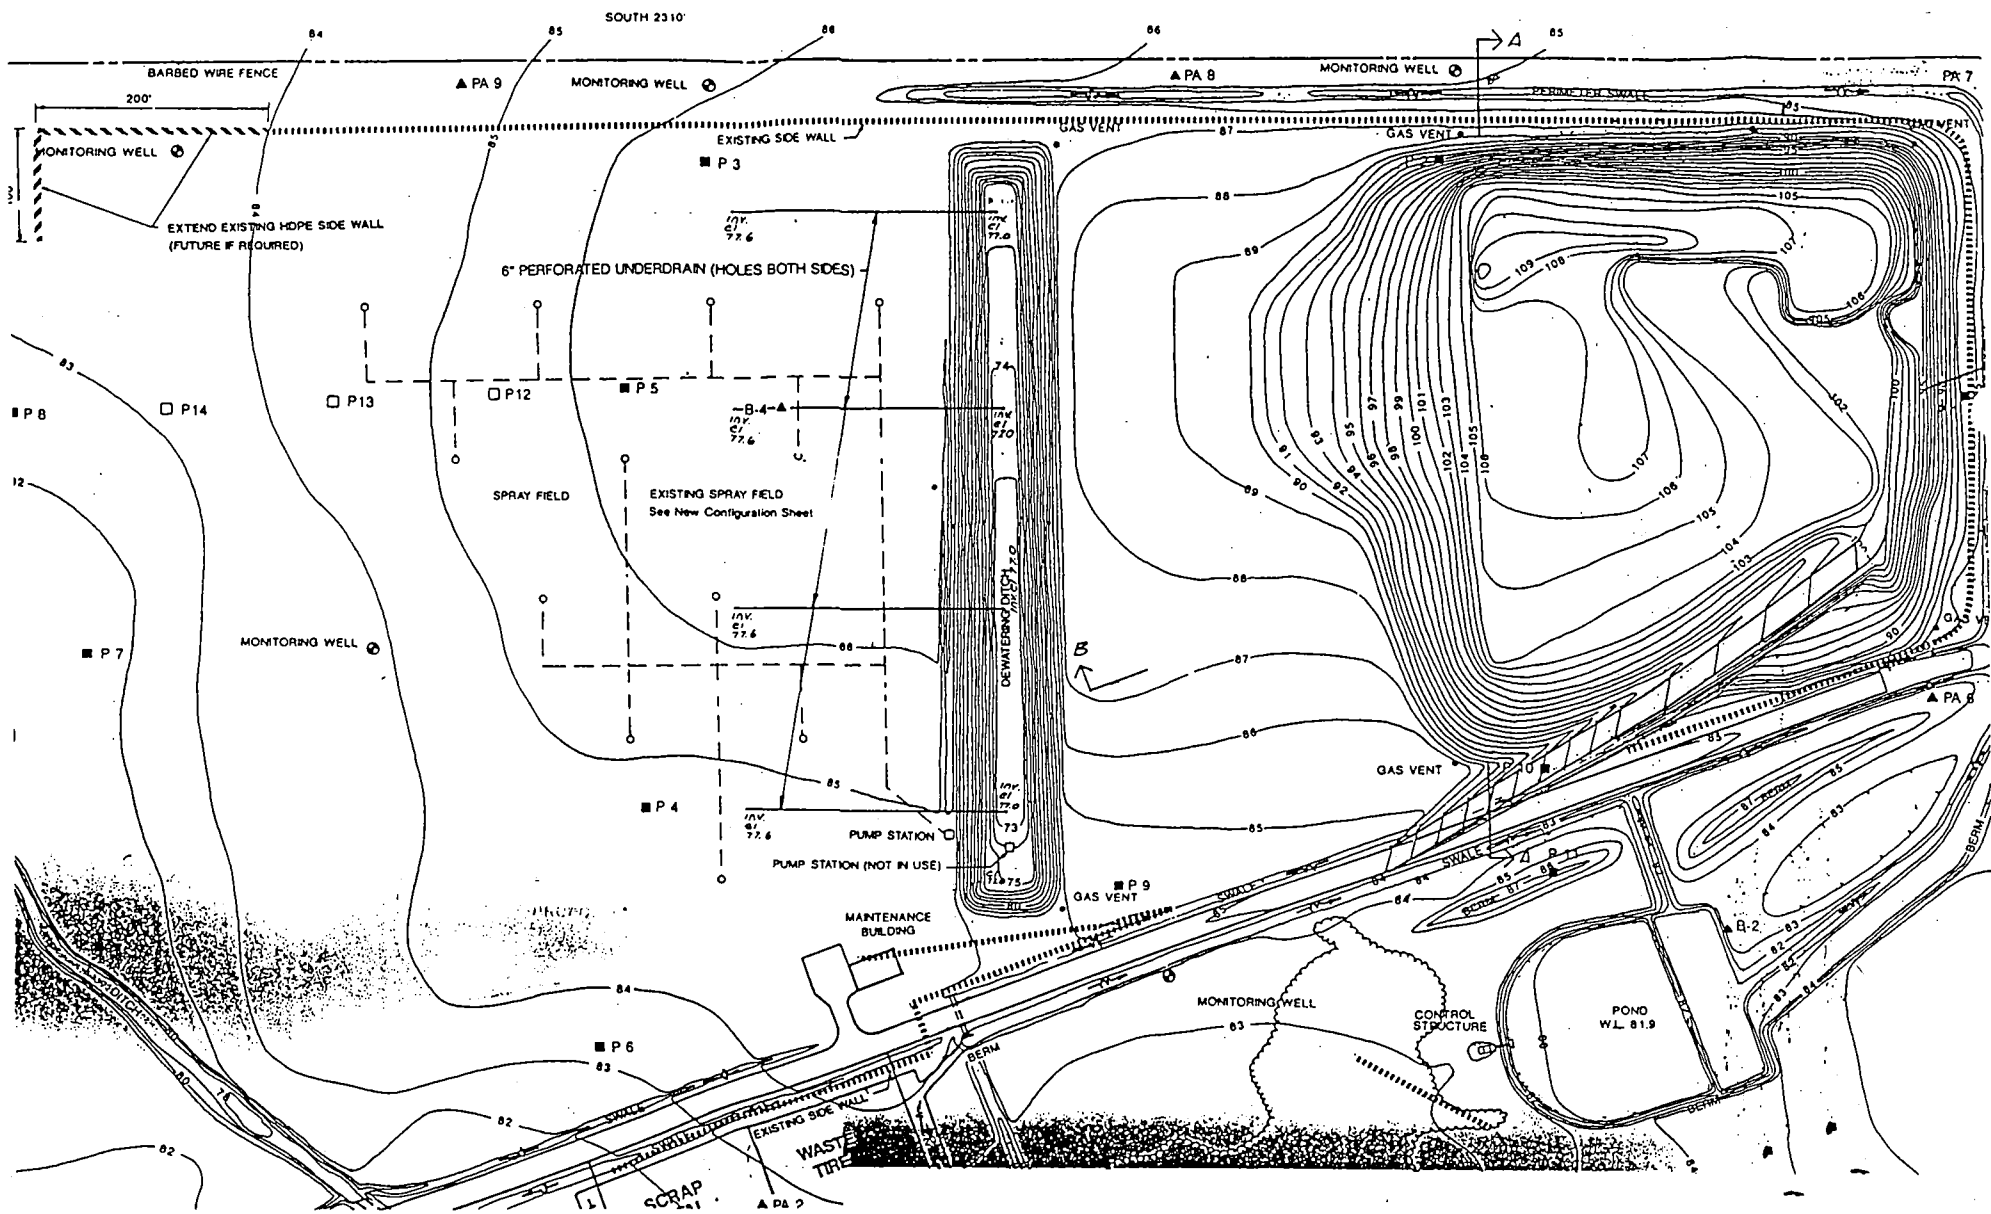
Improvement Site Plan (per 8/2/93 Wade-Trim Sheet 4/6)
